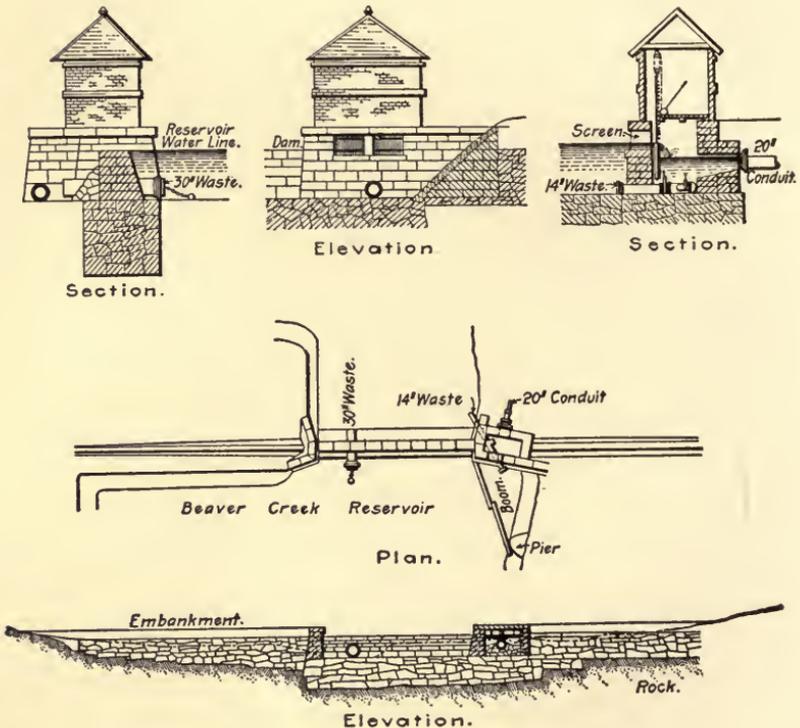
MASONRY DAM AT LITTLE FALLS.
